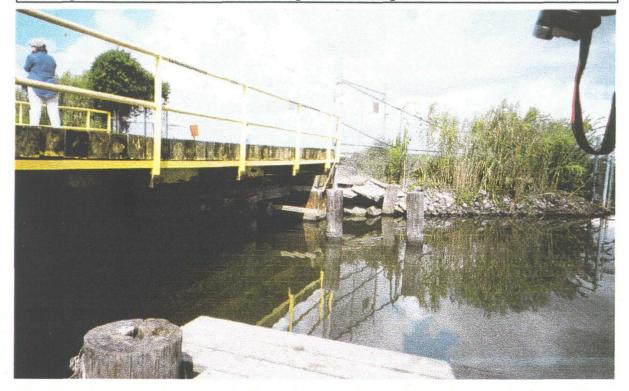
of 23 Date: 7/10/00 Time: 10:15 Taken by: Mark Taylor View looking west at the BWDS site access bridge and of the secondary security gate.
